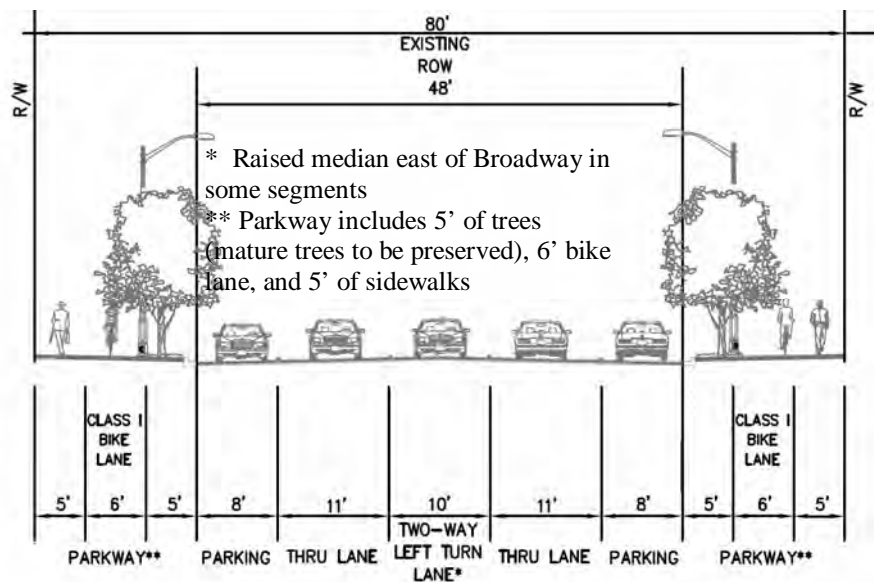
Proposed Cross Section, F Street Between Third Avenue and I-5
